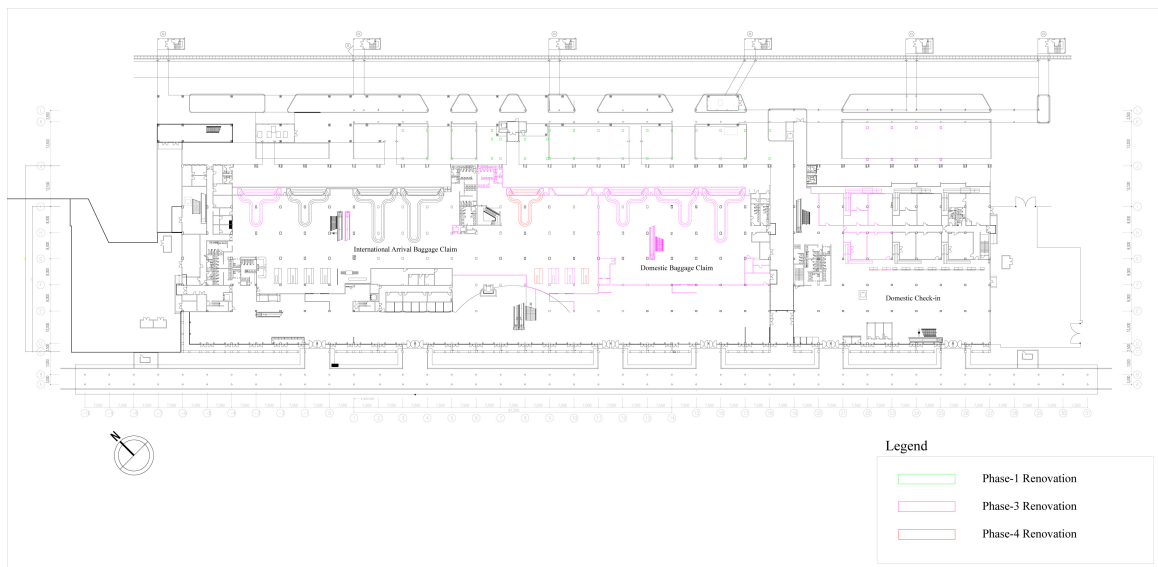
Phase-4 Renovation Plan of Passenger Terminal Building (1st Floor)
